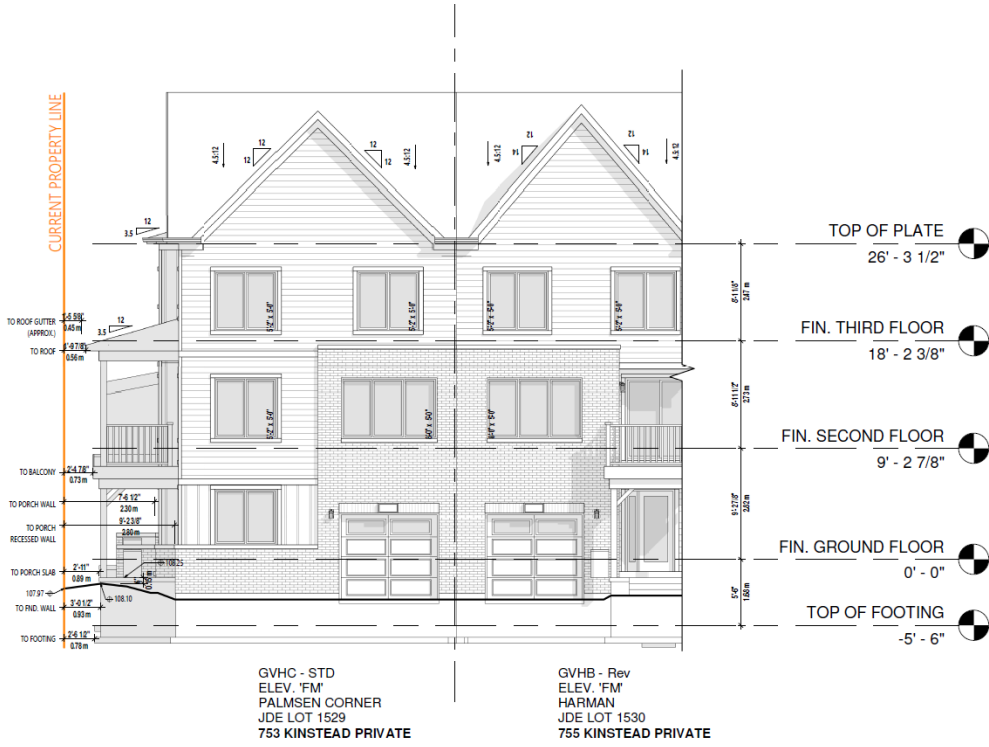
753 Kinstead Private Front Elevation (looking west)
